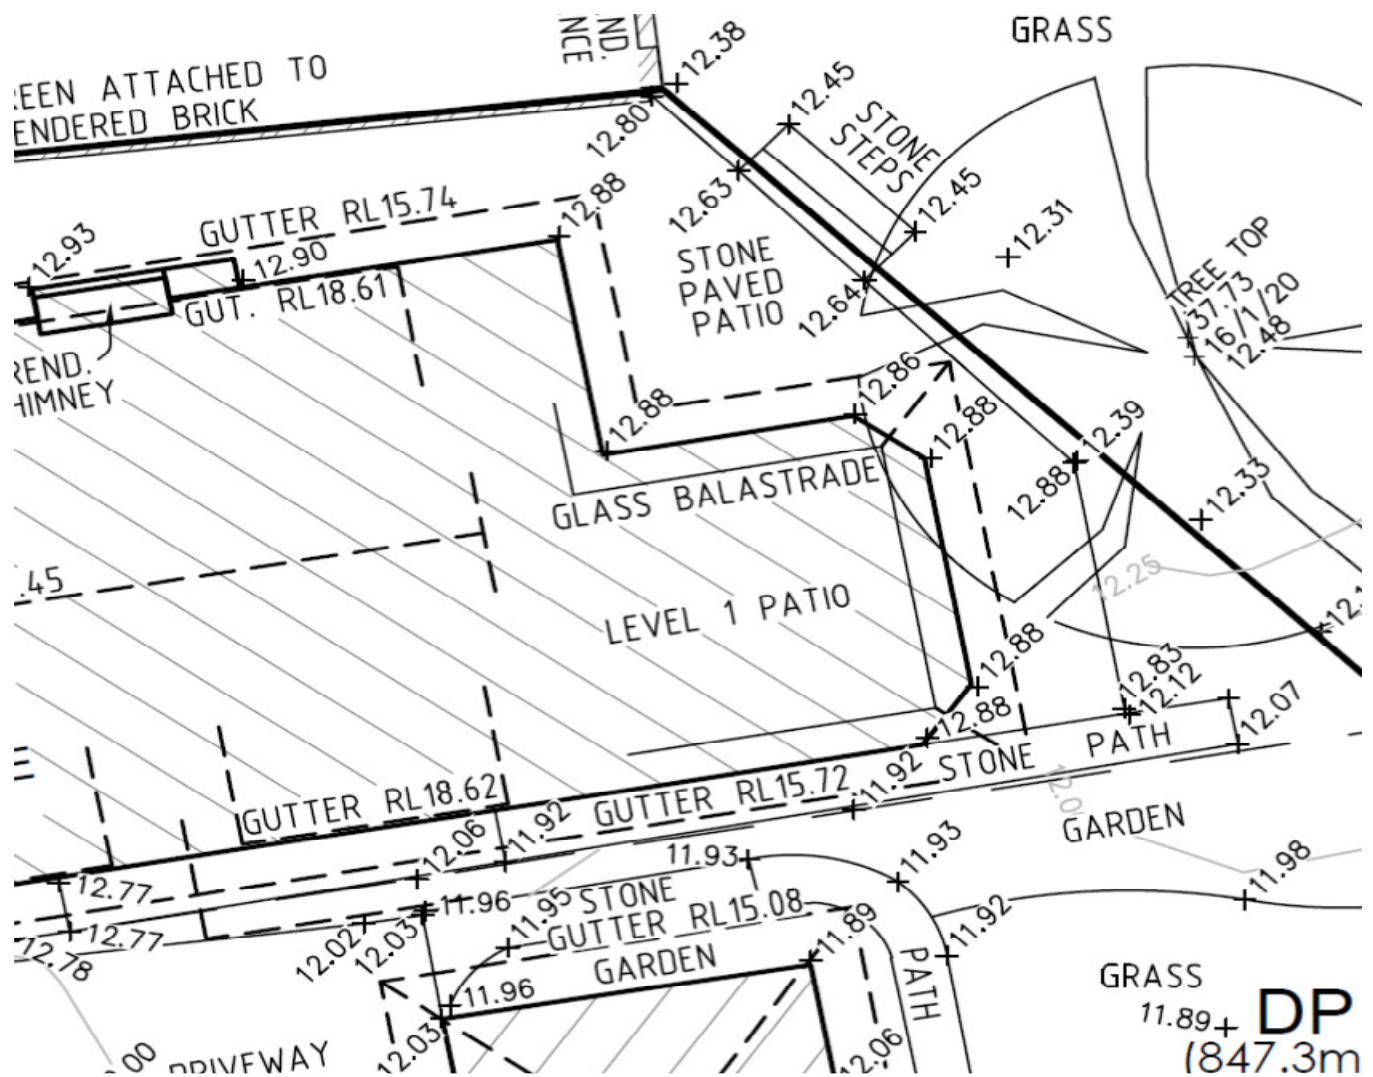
Extract from Survey Plan showing existng dwelling and levels adjacent to Tree 13
